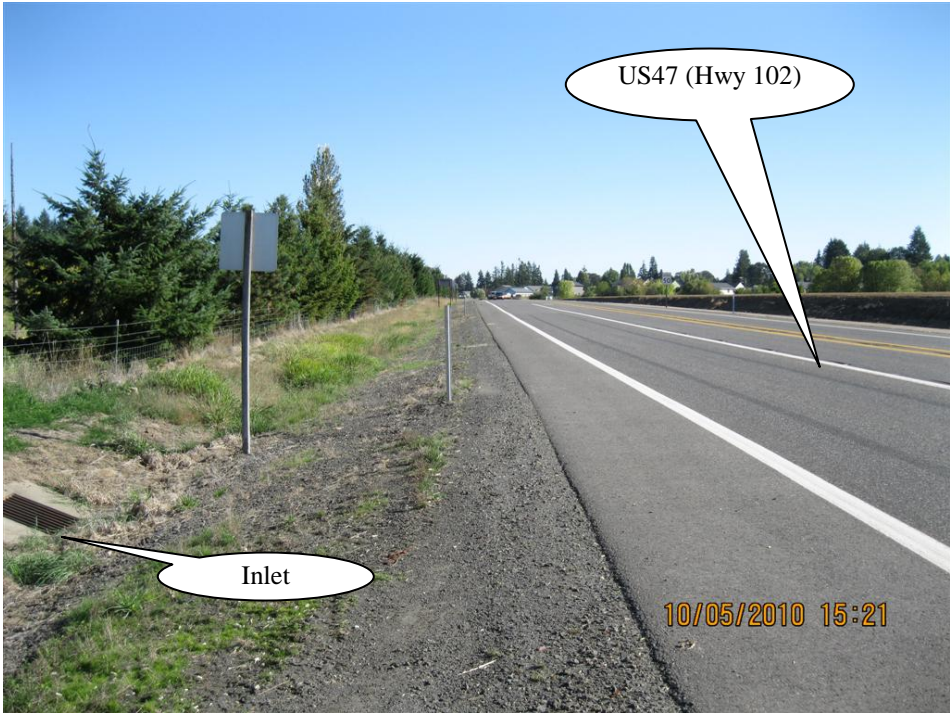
Looking towards the southeast at the roadside drainage ditch.
